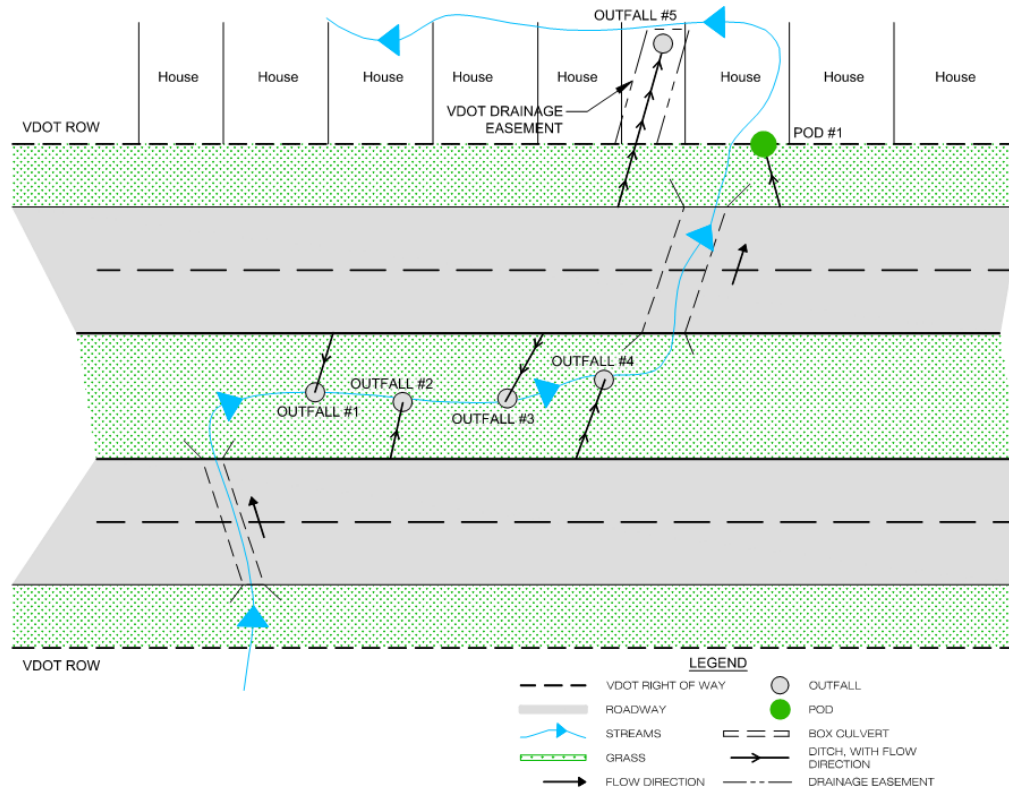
Scenario 8 – Roadside Ditch and Surface Water Draining Offsite
